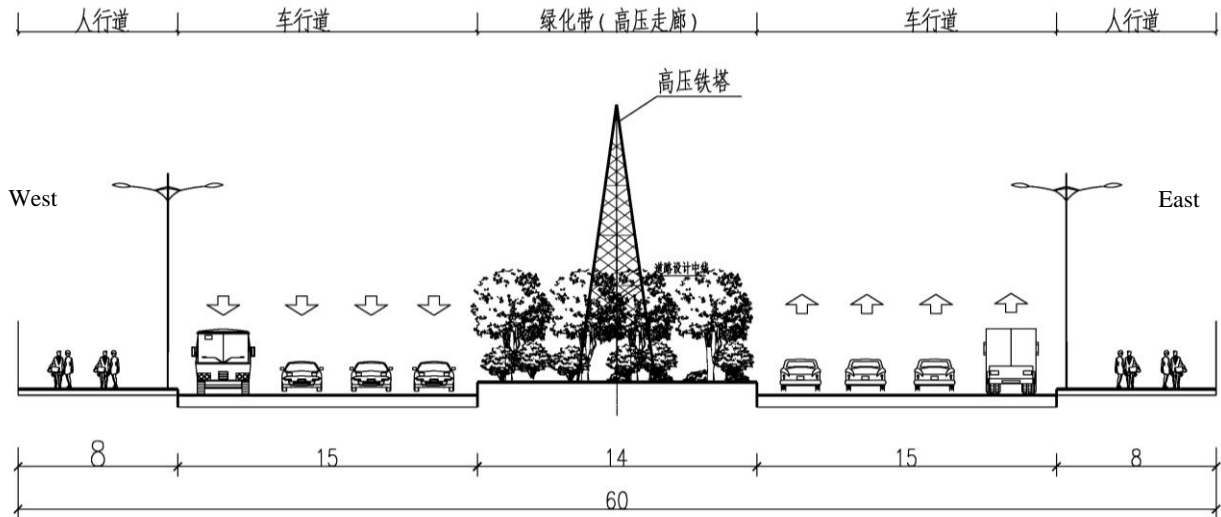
Existing Cross Section of Jinqiu Avenue (Yinxing Avenue~Biyun Road)
